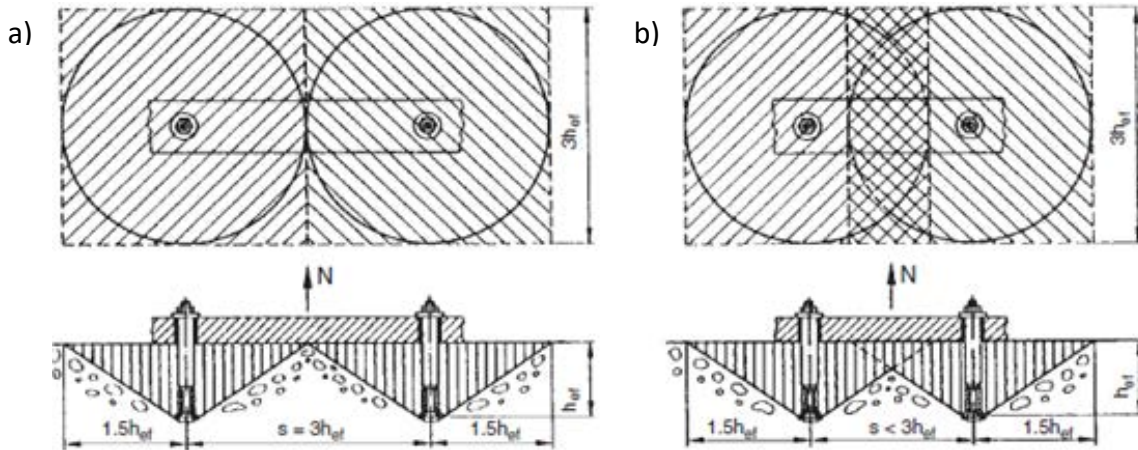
Failure area of an anchor group (Eligehausen et al. 2006): (a) large spacing with no overlapping area; (b) small spacing with overlapping area
